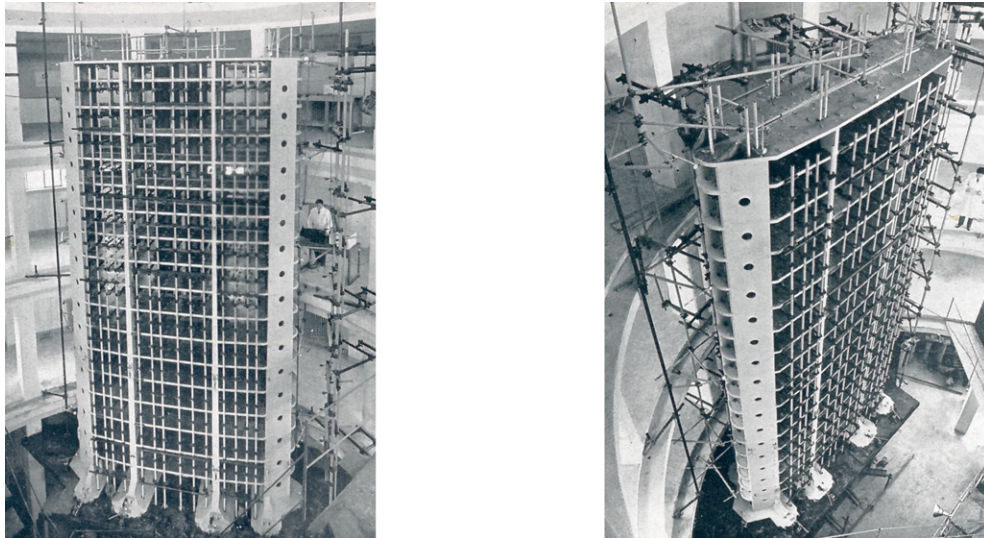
Structural model of the entire building (scale 1:15). From [39].
